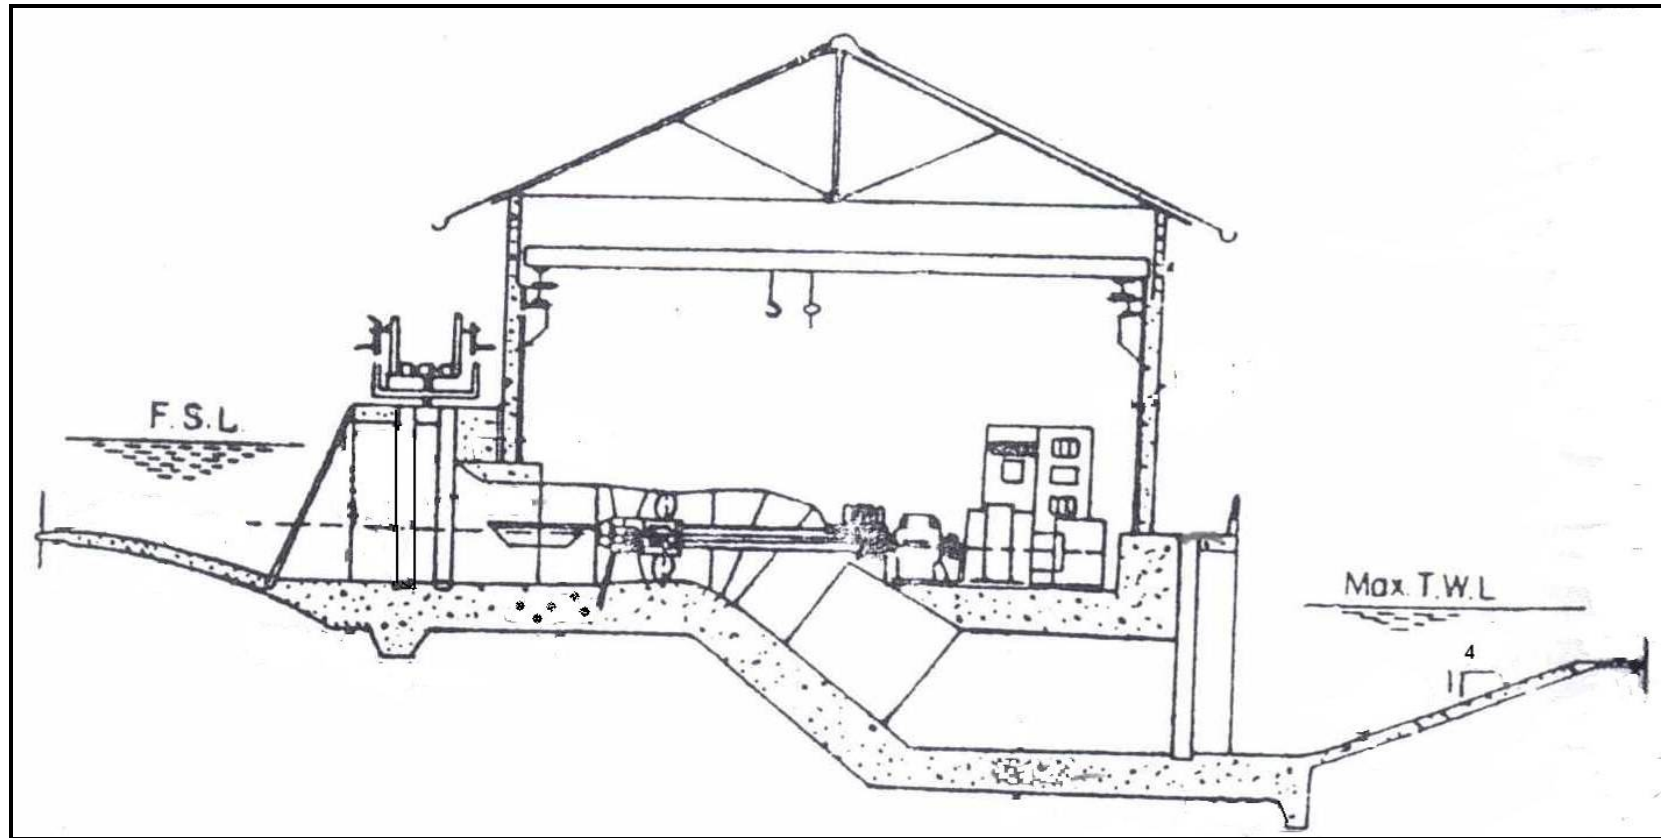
Typical Transverse Section of Power House with Tubular Turbine
